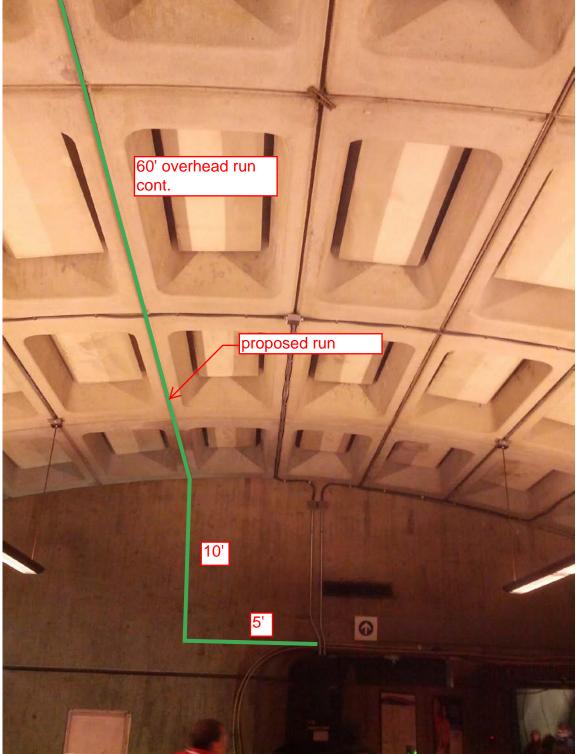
A03 Dupont Circle South: Proposed overhead conduit running into Room #201. Run will need to penetrate metal over door.
